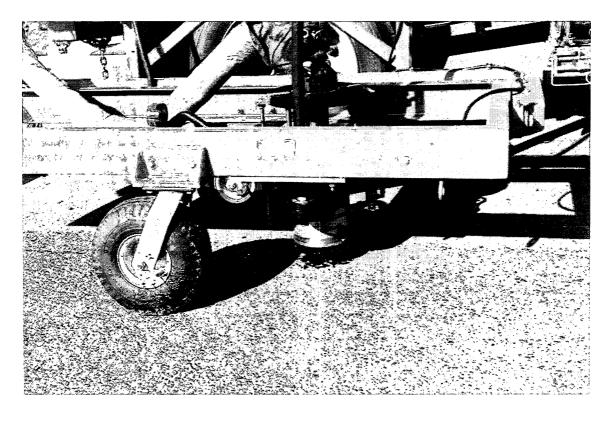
The Sealant Applicator At The End Of The Longitudinal Machine.
